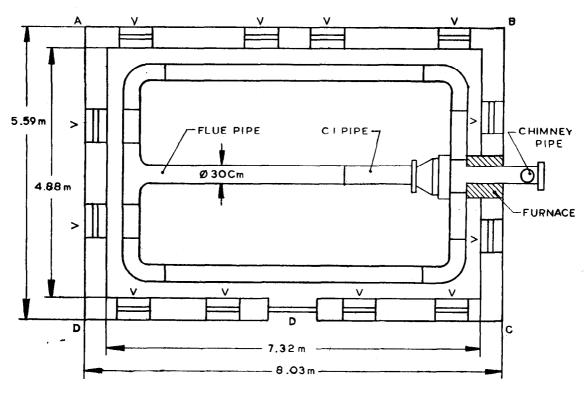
Ground Plan with Flue Pipe Arrangement (Andhra Barn)
